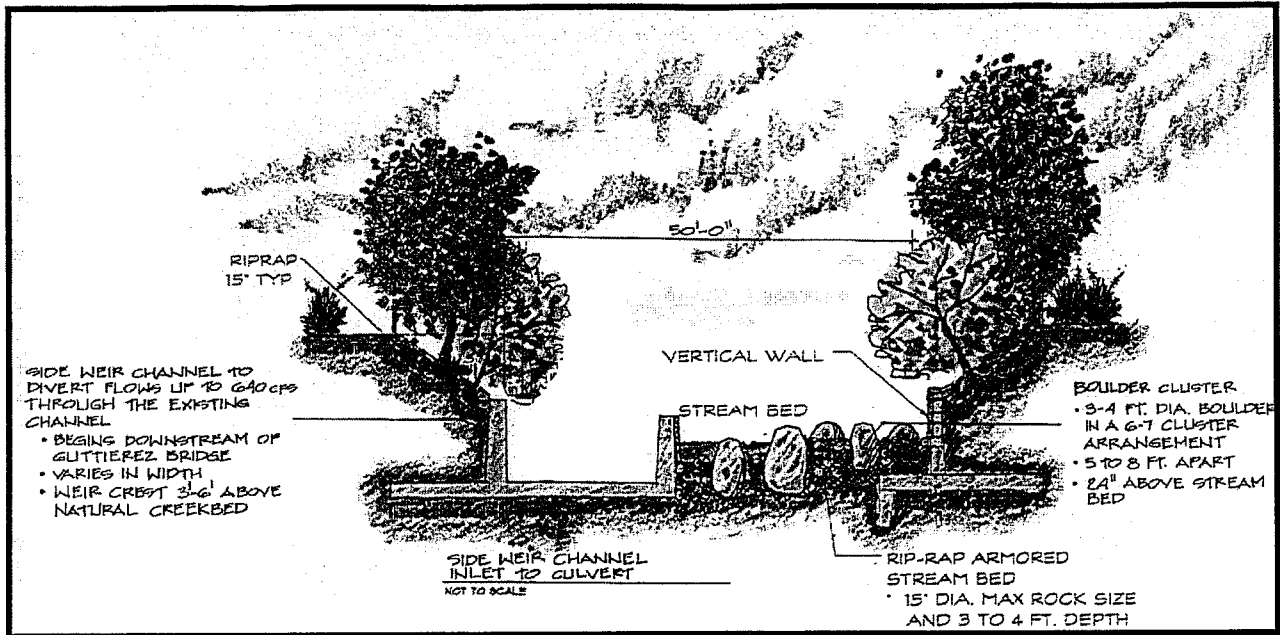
Representative Cross Section of the Side Weir Channel Inlet to Overflow Culvert
